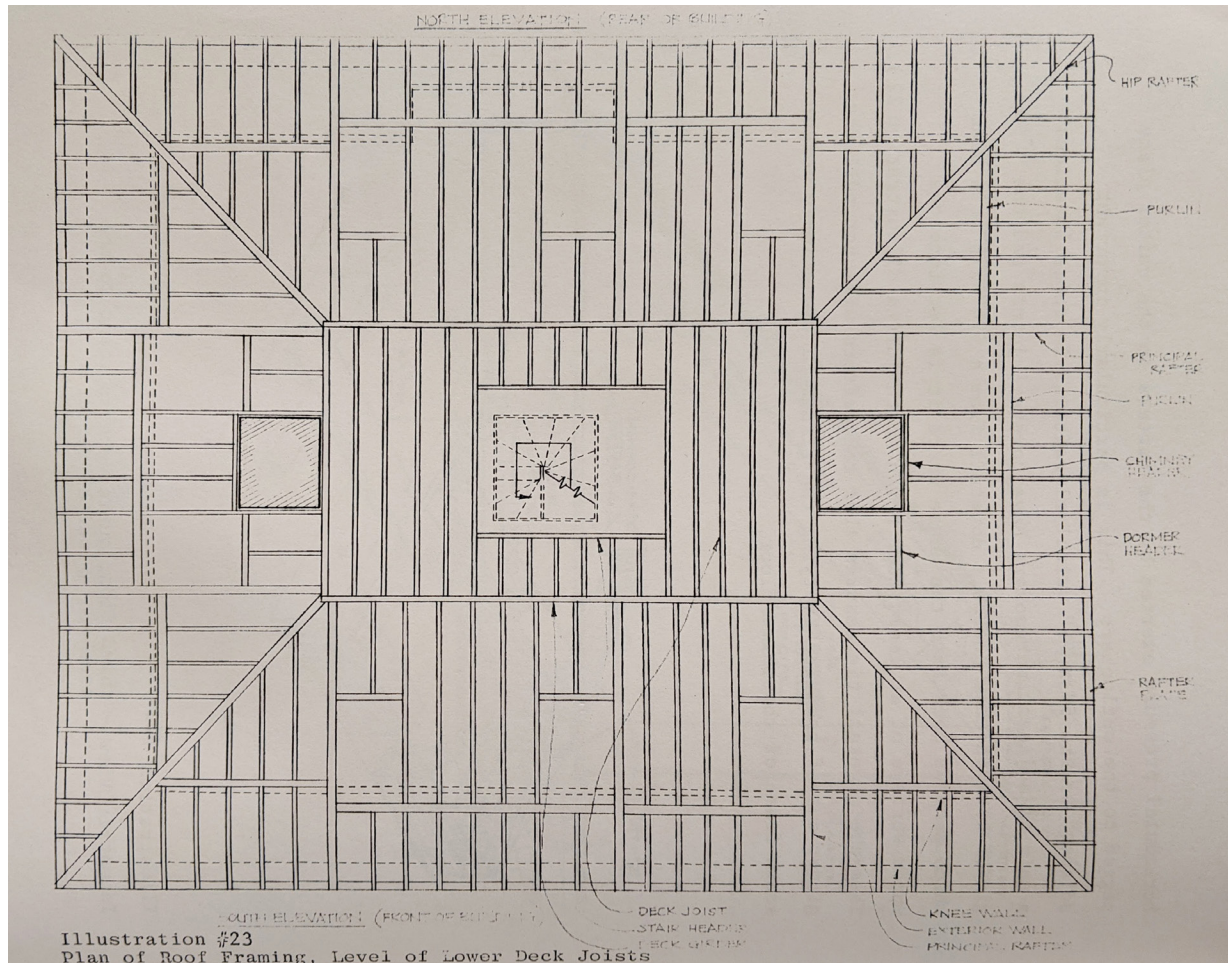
Dickey Roofing Plan, Source: Stenton HSR
